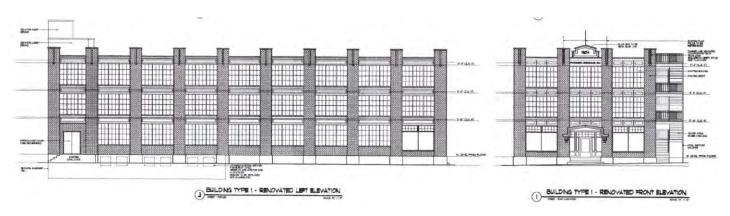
Early concept for rehabilitation of west and rear (south) elevations. *Courtesy N.T.S. Architects & Planners, Inc.
